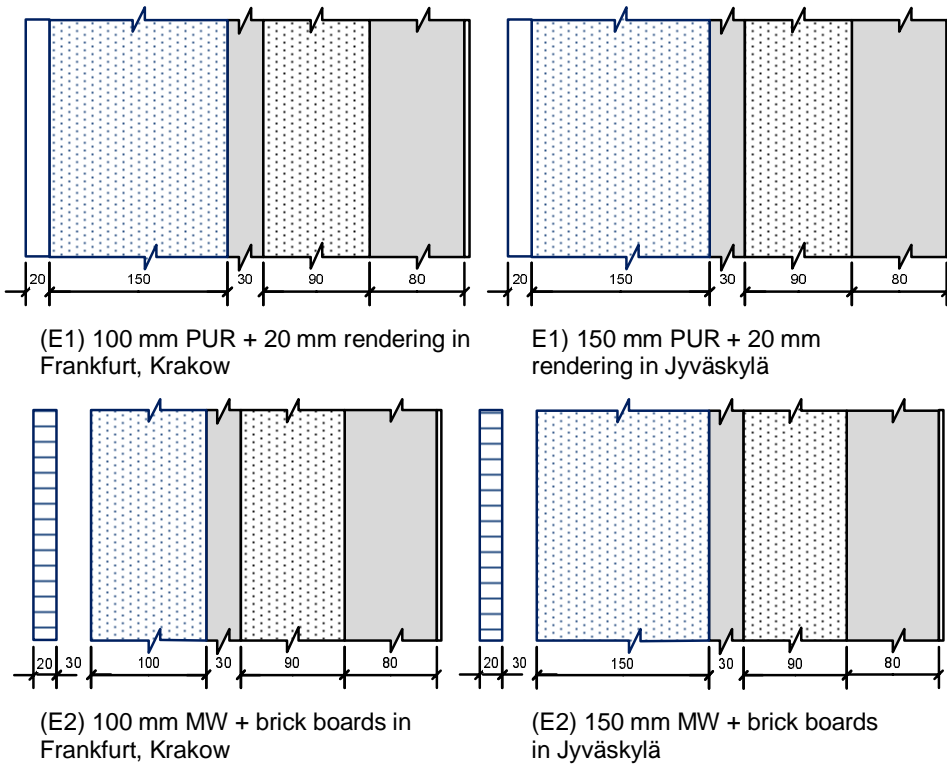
Refurbishment methods of a concrete sandwich element wall.
